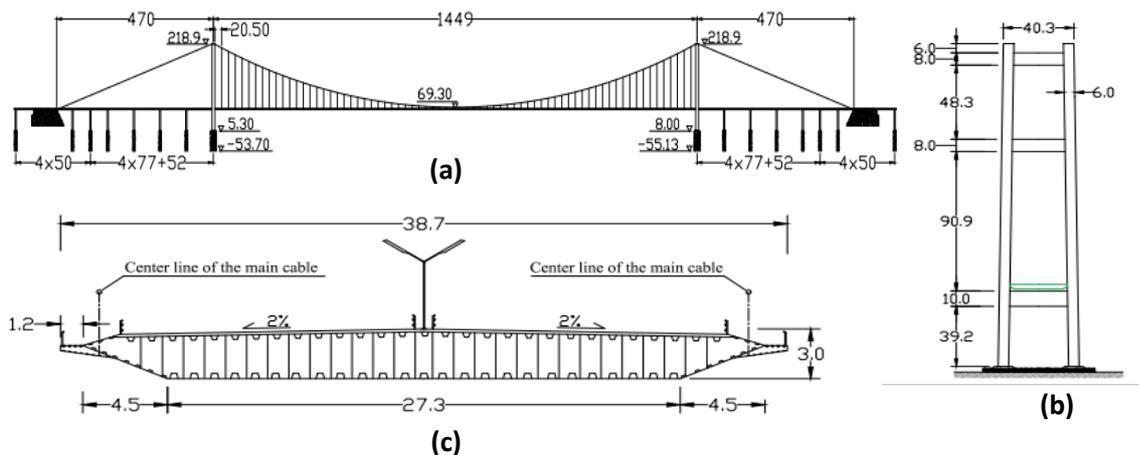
The RSB (a) elevation. (b) Geometry of the tower. (c) Cross-section girder. (Dimensions in m)
